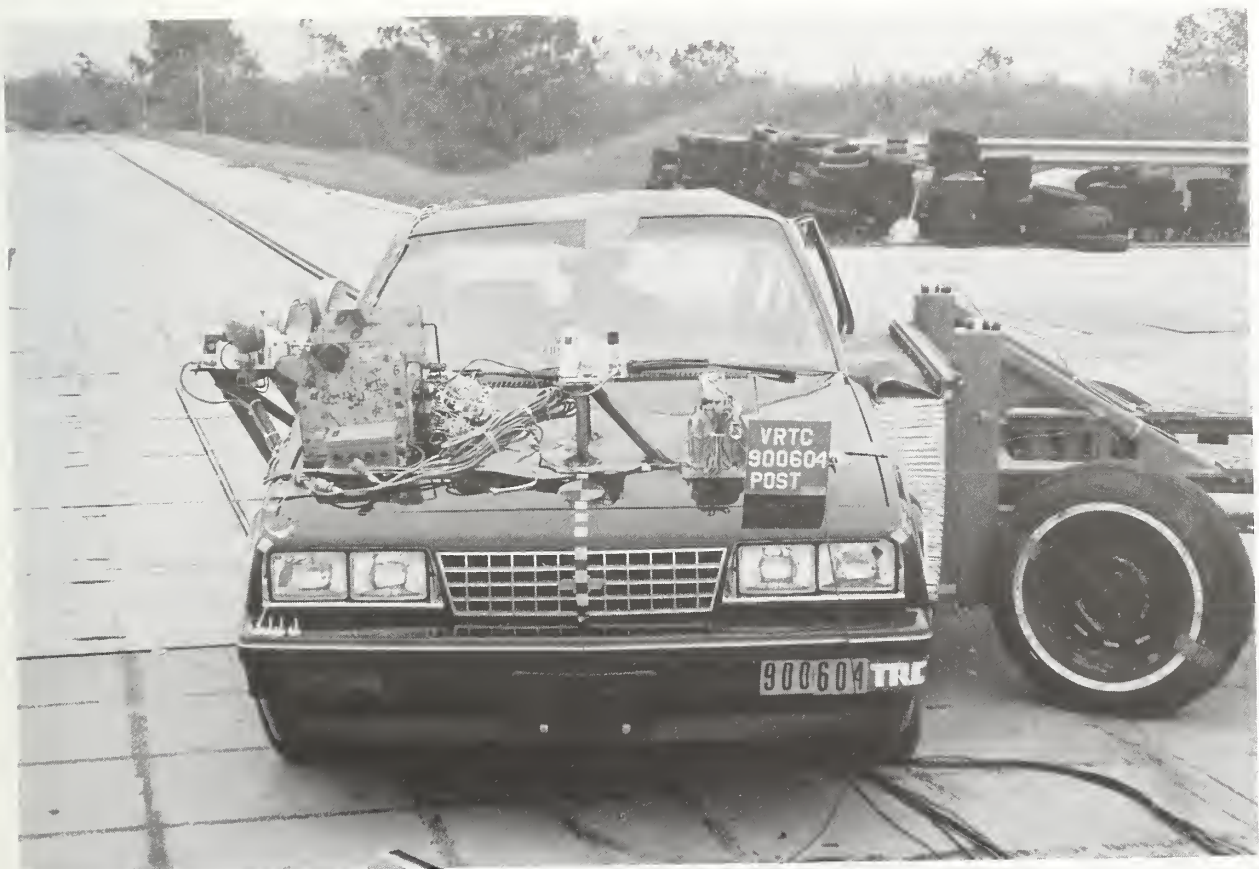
POST-TEST VEHICLE FRONT AND BARRIER - VIEW 1
